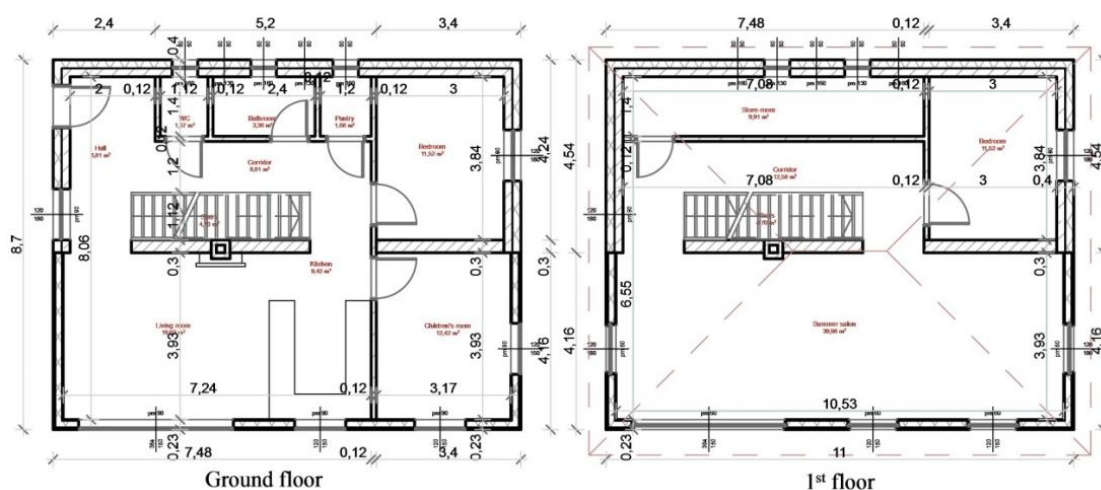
Layout of the house. The position of the materials is changing depending on variants but not the size and organisation of the house. In this variant, North faces are made of concrete and Southern facades are of wood.
